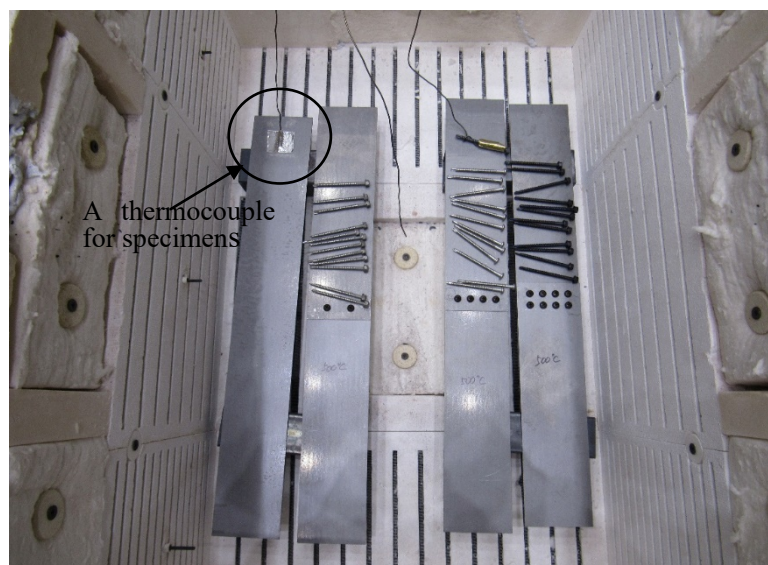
Steel sheets and screwed-connection specimens in a furnace
